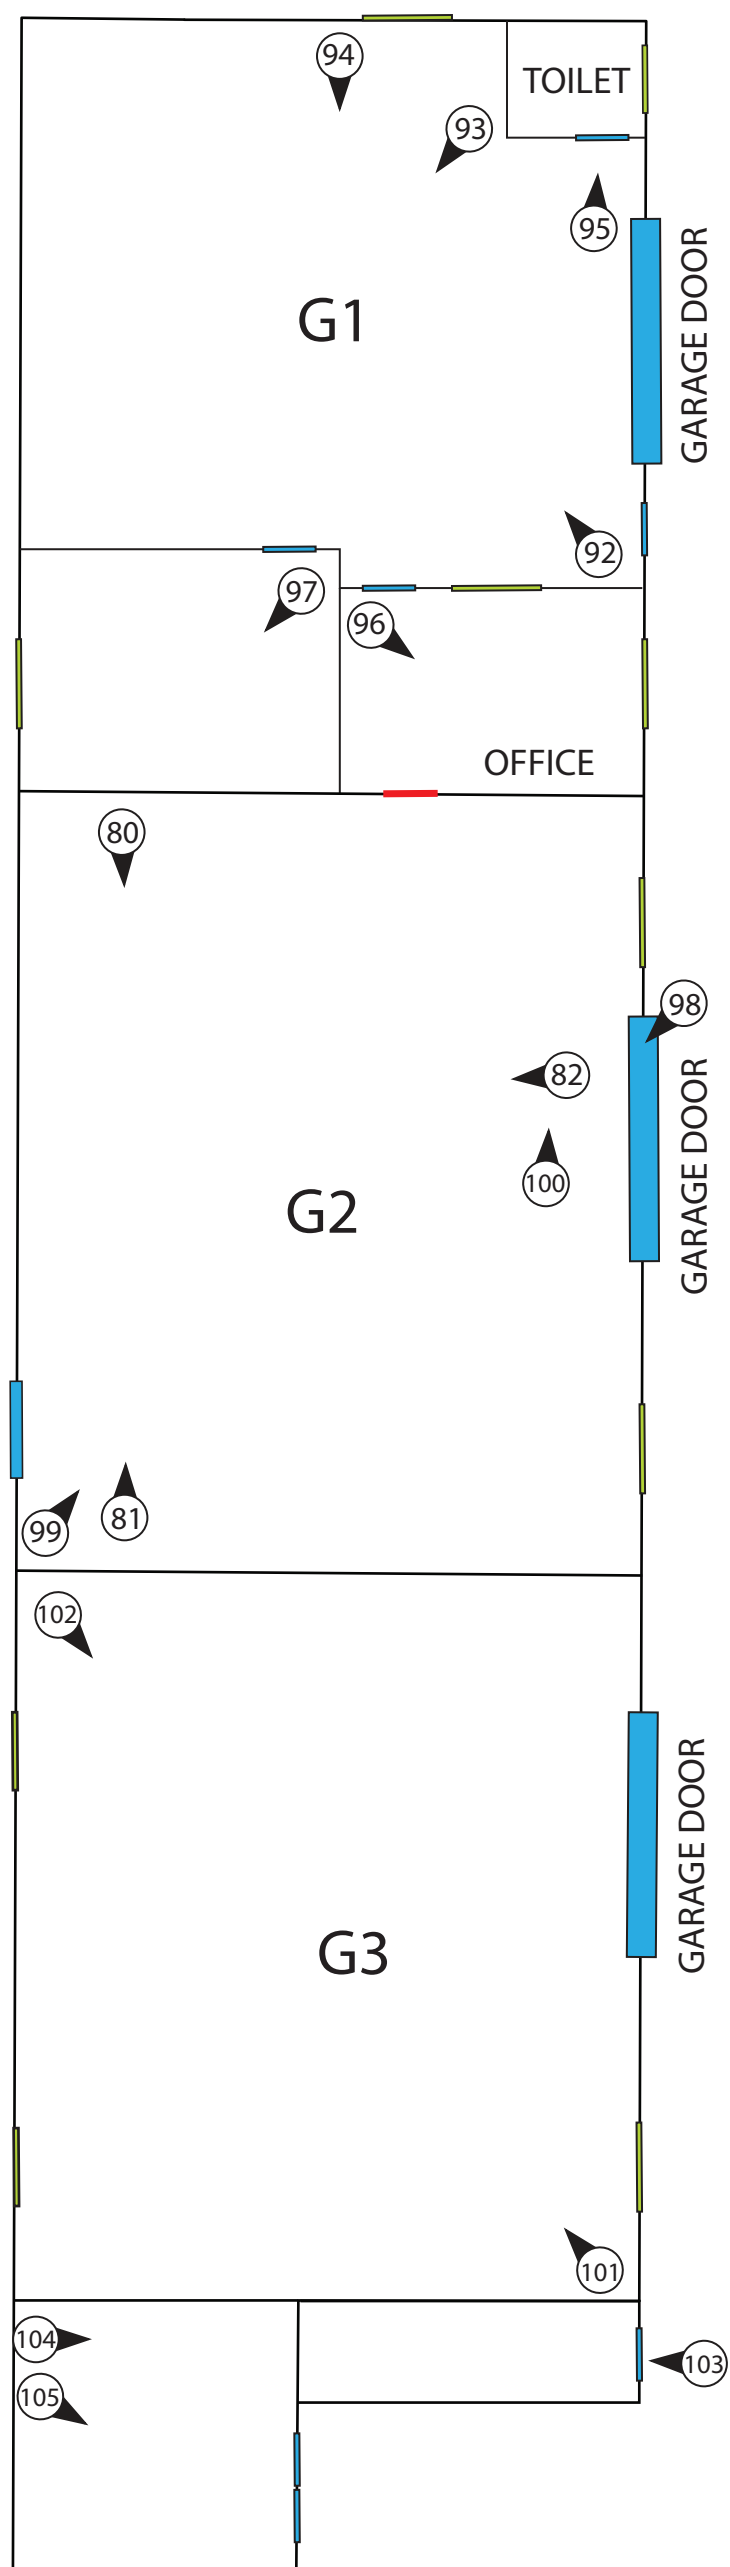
Plan of Unit G buildings showing internal structures and photo locations
